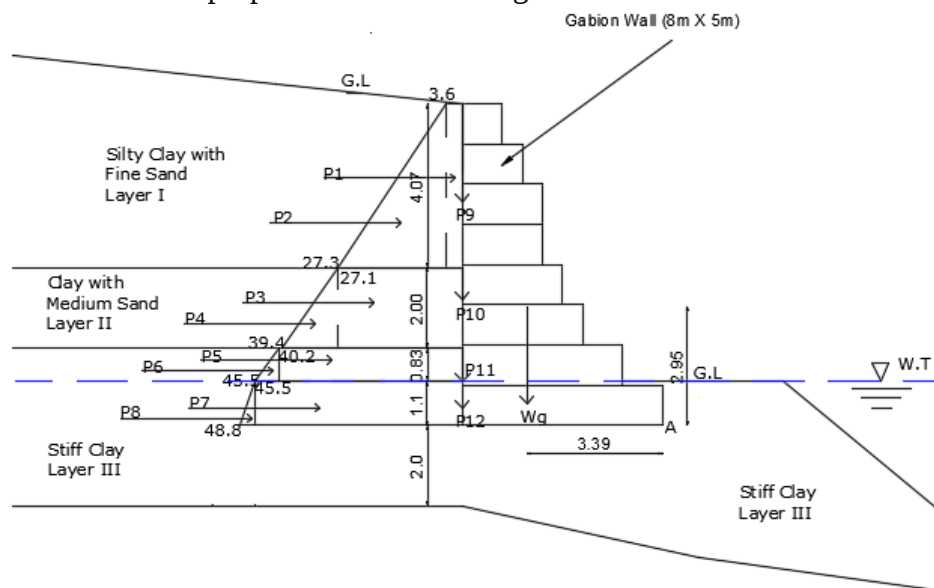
Active earth pressure and forces acting on the gabion wall
